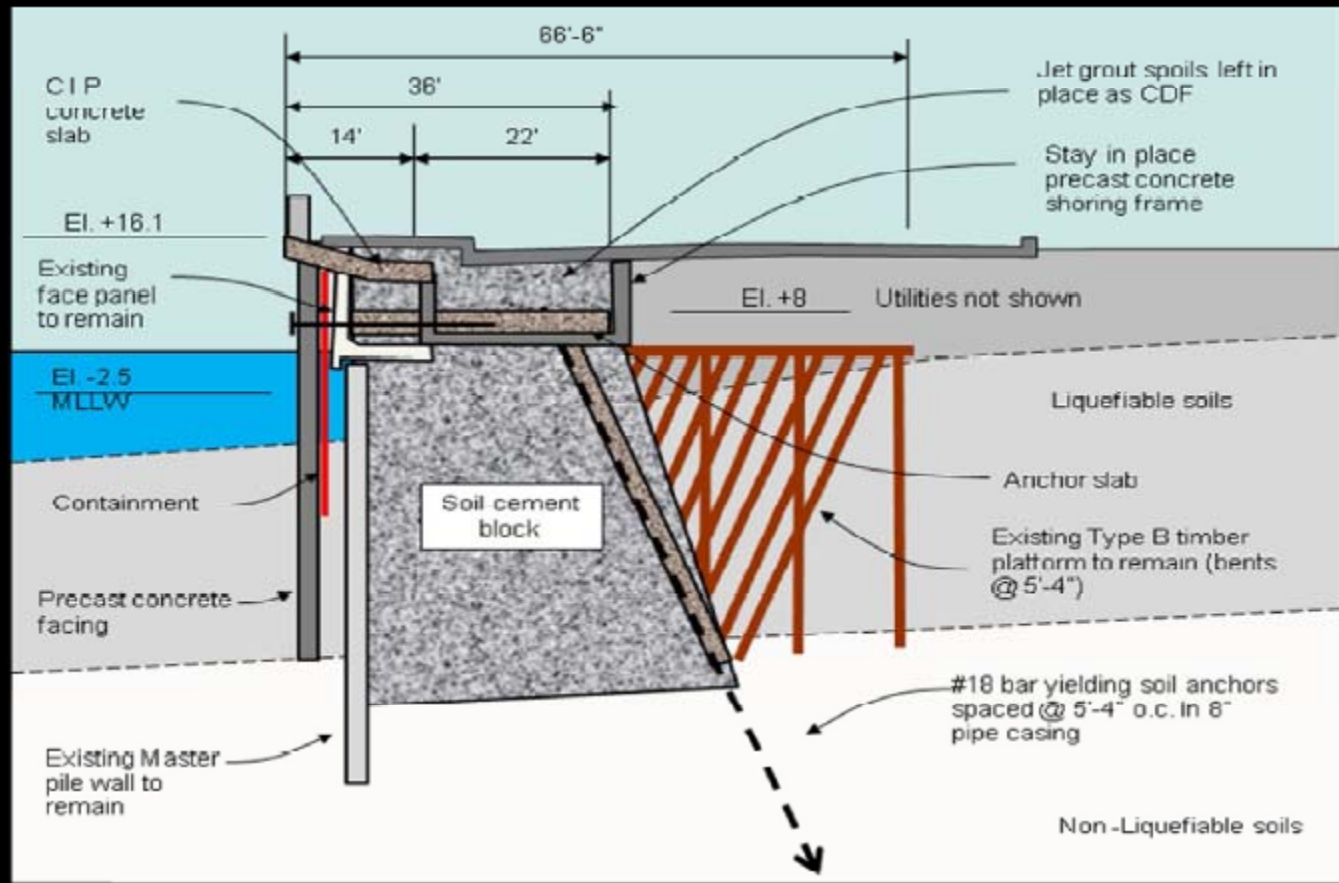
Proposed Type B Anchored Soil Improvement Concept
